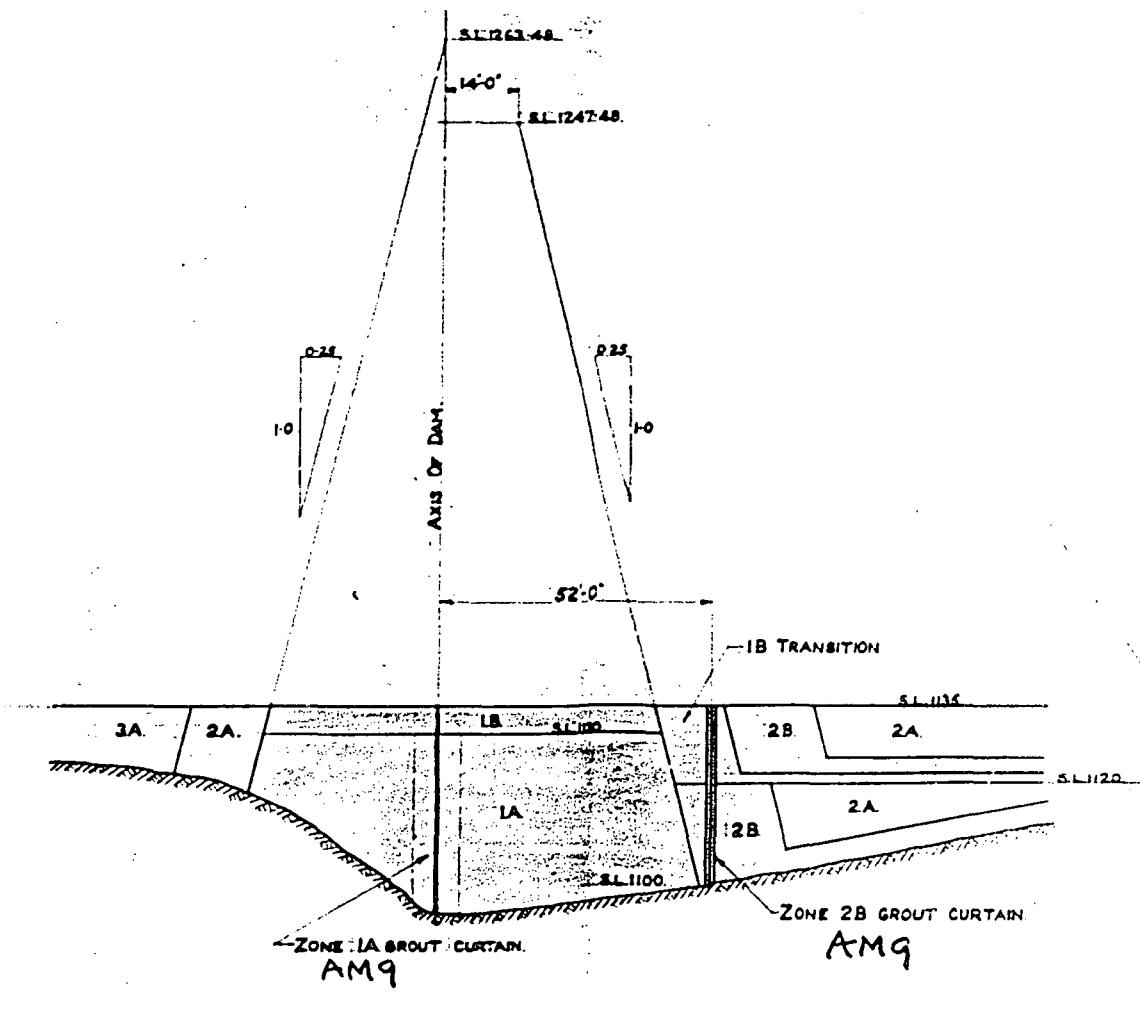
X-Section, Parangana Dam core and filter grouting
